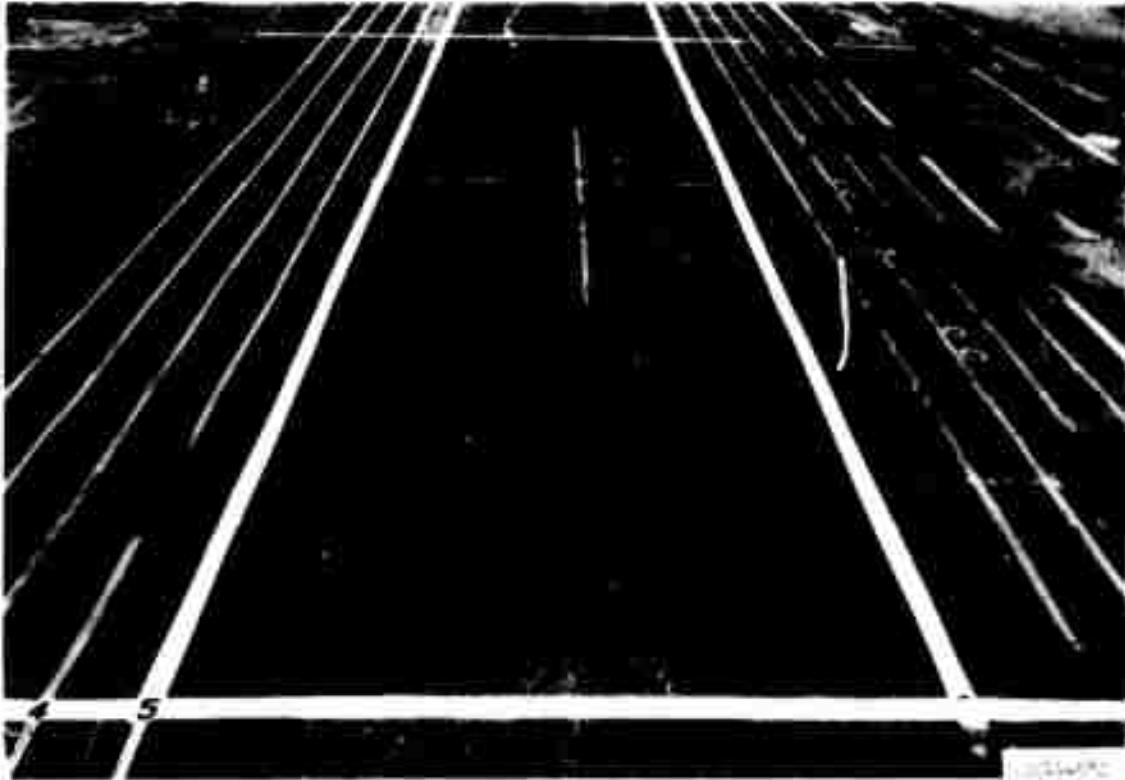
Item 5, lane 2, flexible pavement test section, prior to traffic
